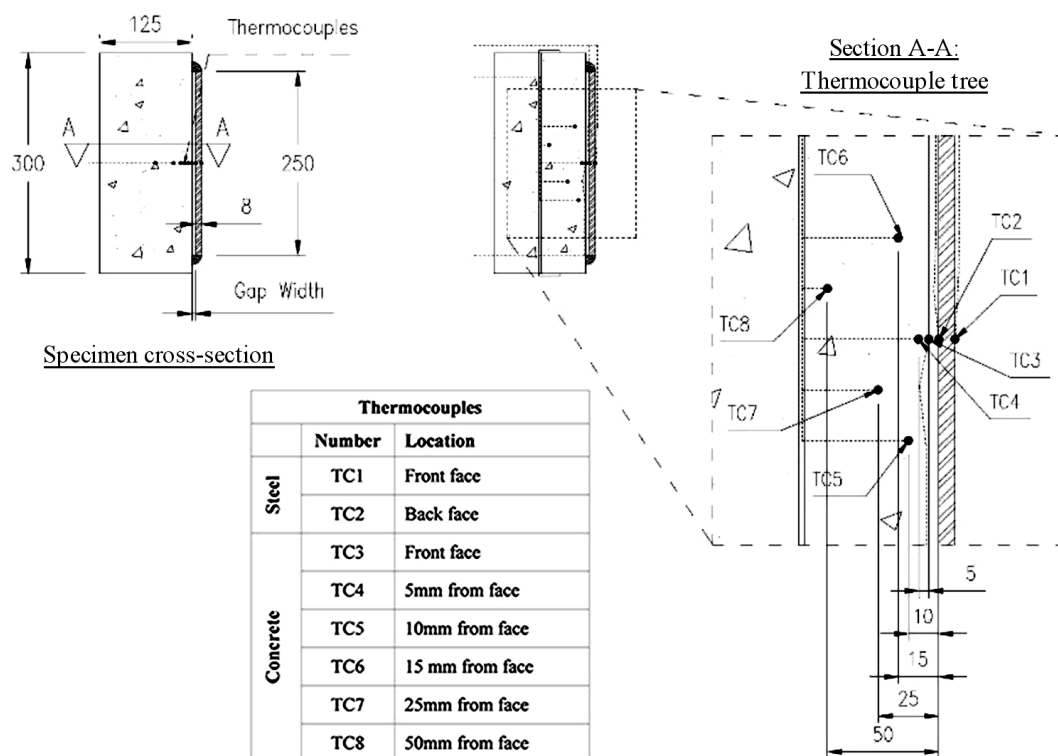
Specimen cross-sections and thermocouple layout and locations
